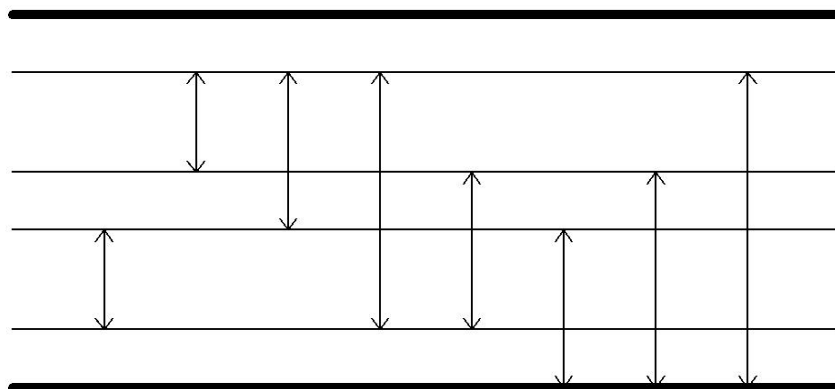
Some Possible Wall Heights; walls may pass through the bottom two truss zones, allowing double height spaces.
